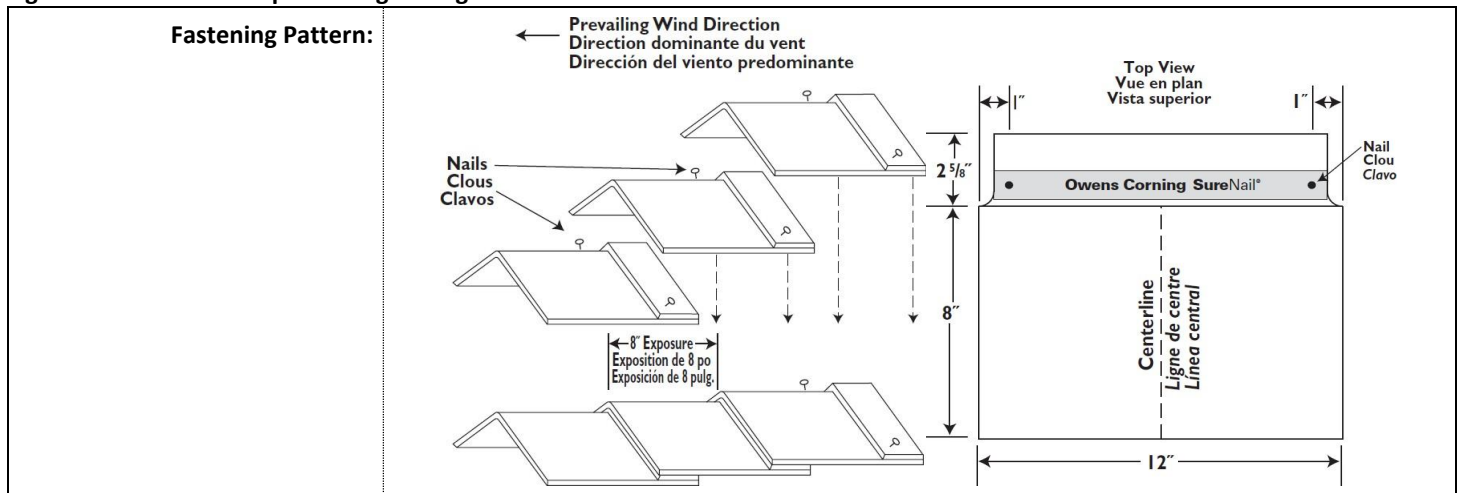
DuraRidge™ Hip and Ridge Shingles
